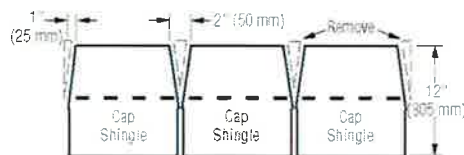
Cut tabs, then trim back to make cap shingles (English dimensions shown).
